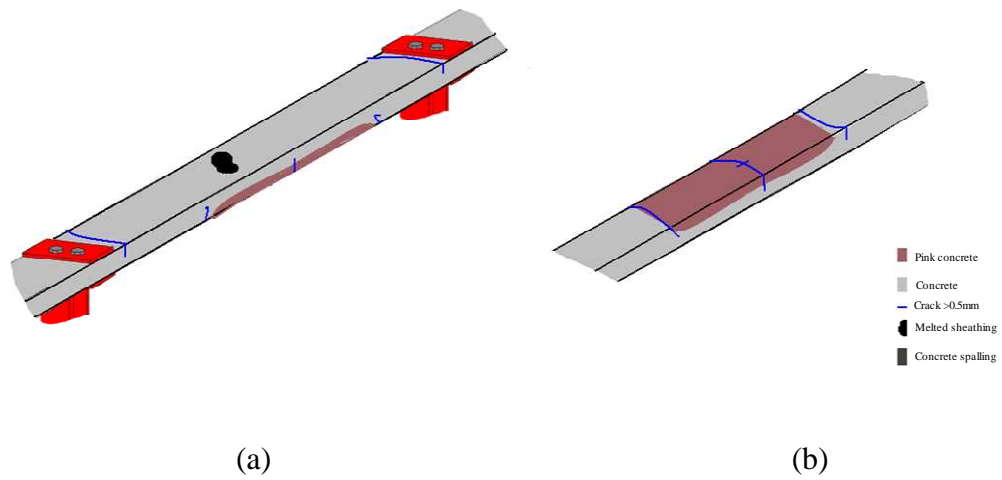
Cracking and heating pattern of Slab A centre span (a) unexposed surface view and (b) exposed surface view (upturned).
